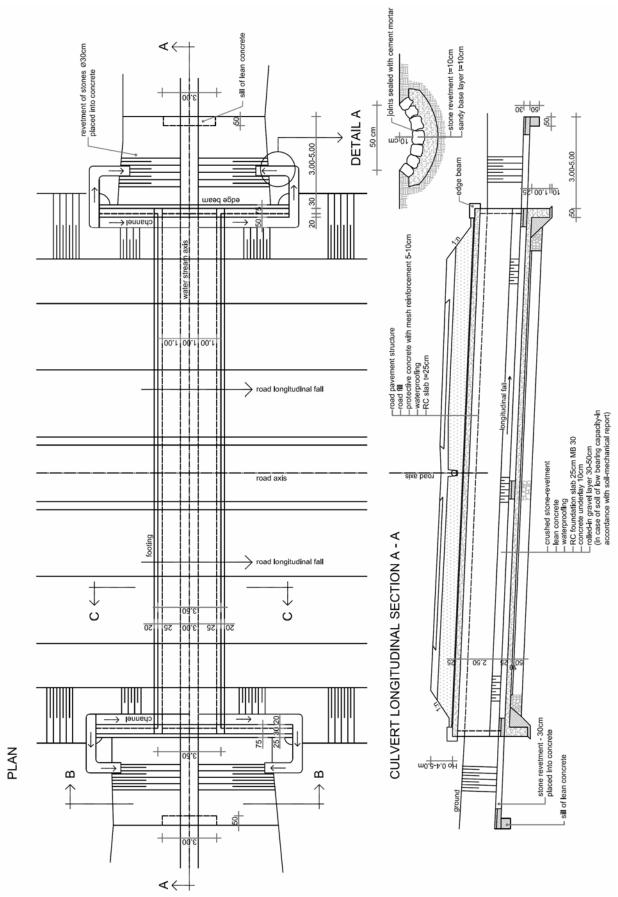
Example of layout of a box culvert with an opening of 3.00/2.50 m with parallel wings
